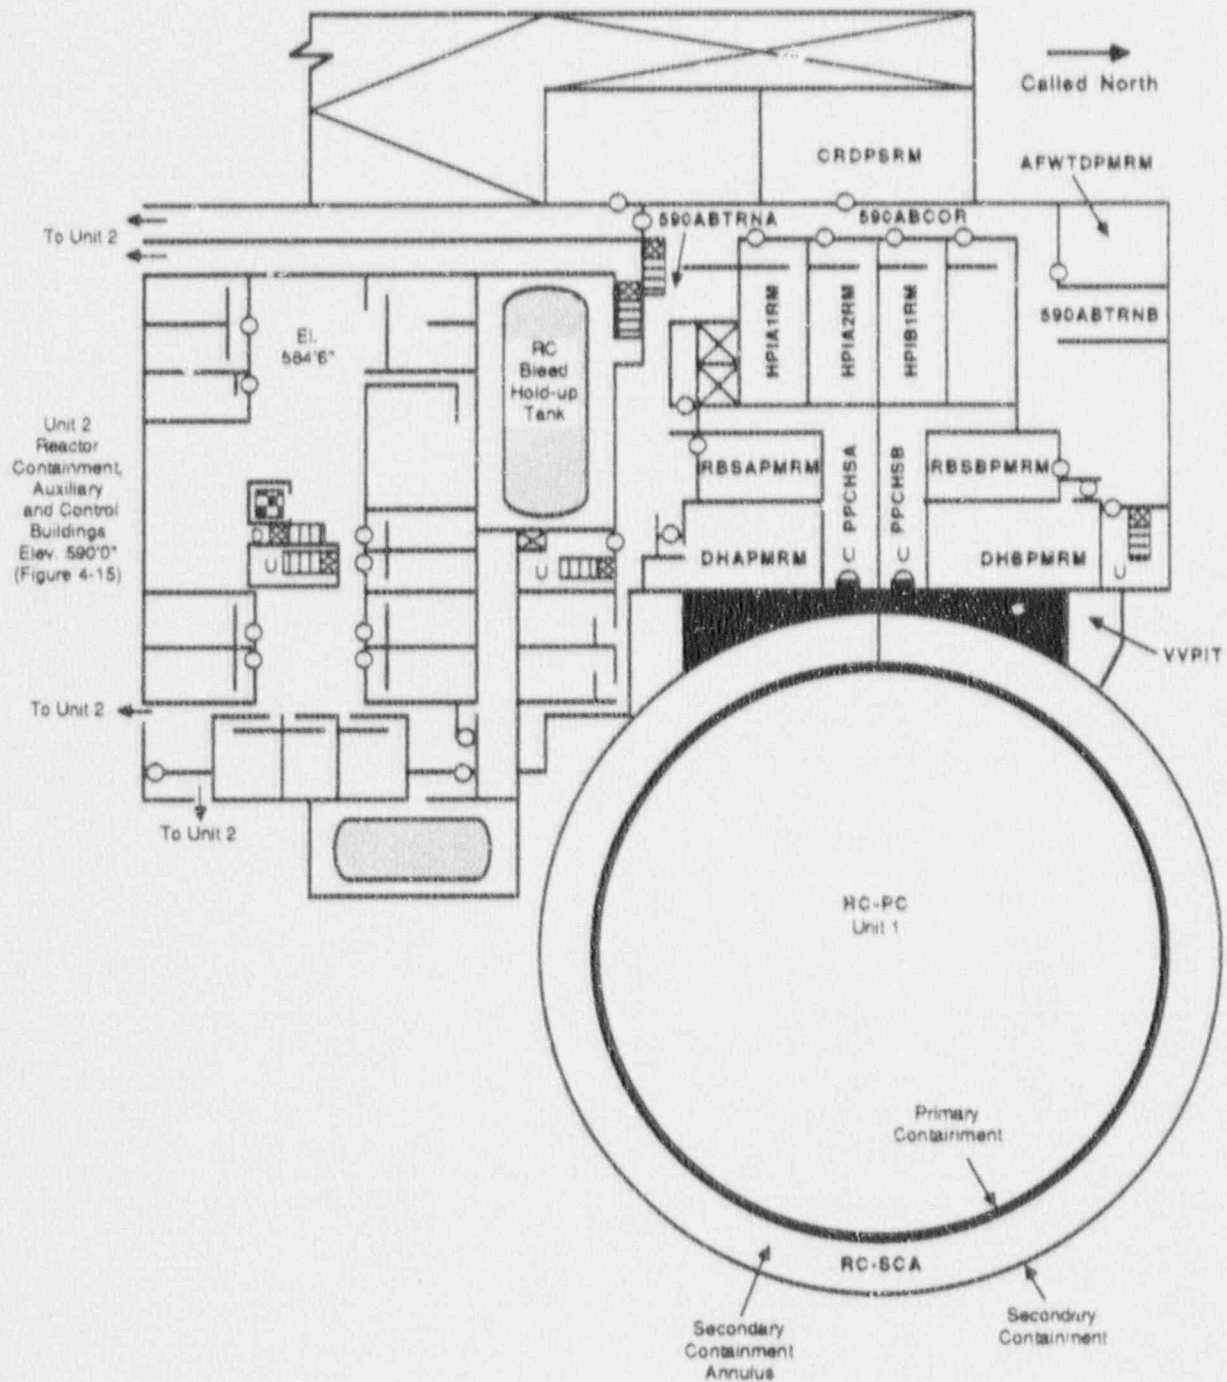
Bellefonte 1 Reactor Containment, Auxiliary and Control Buildings, Elevation 590'-0"
